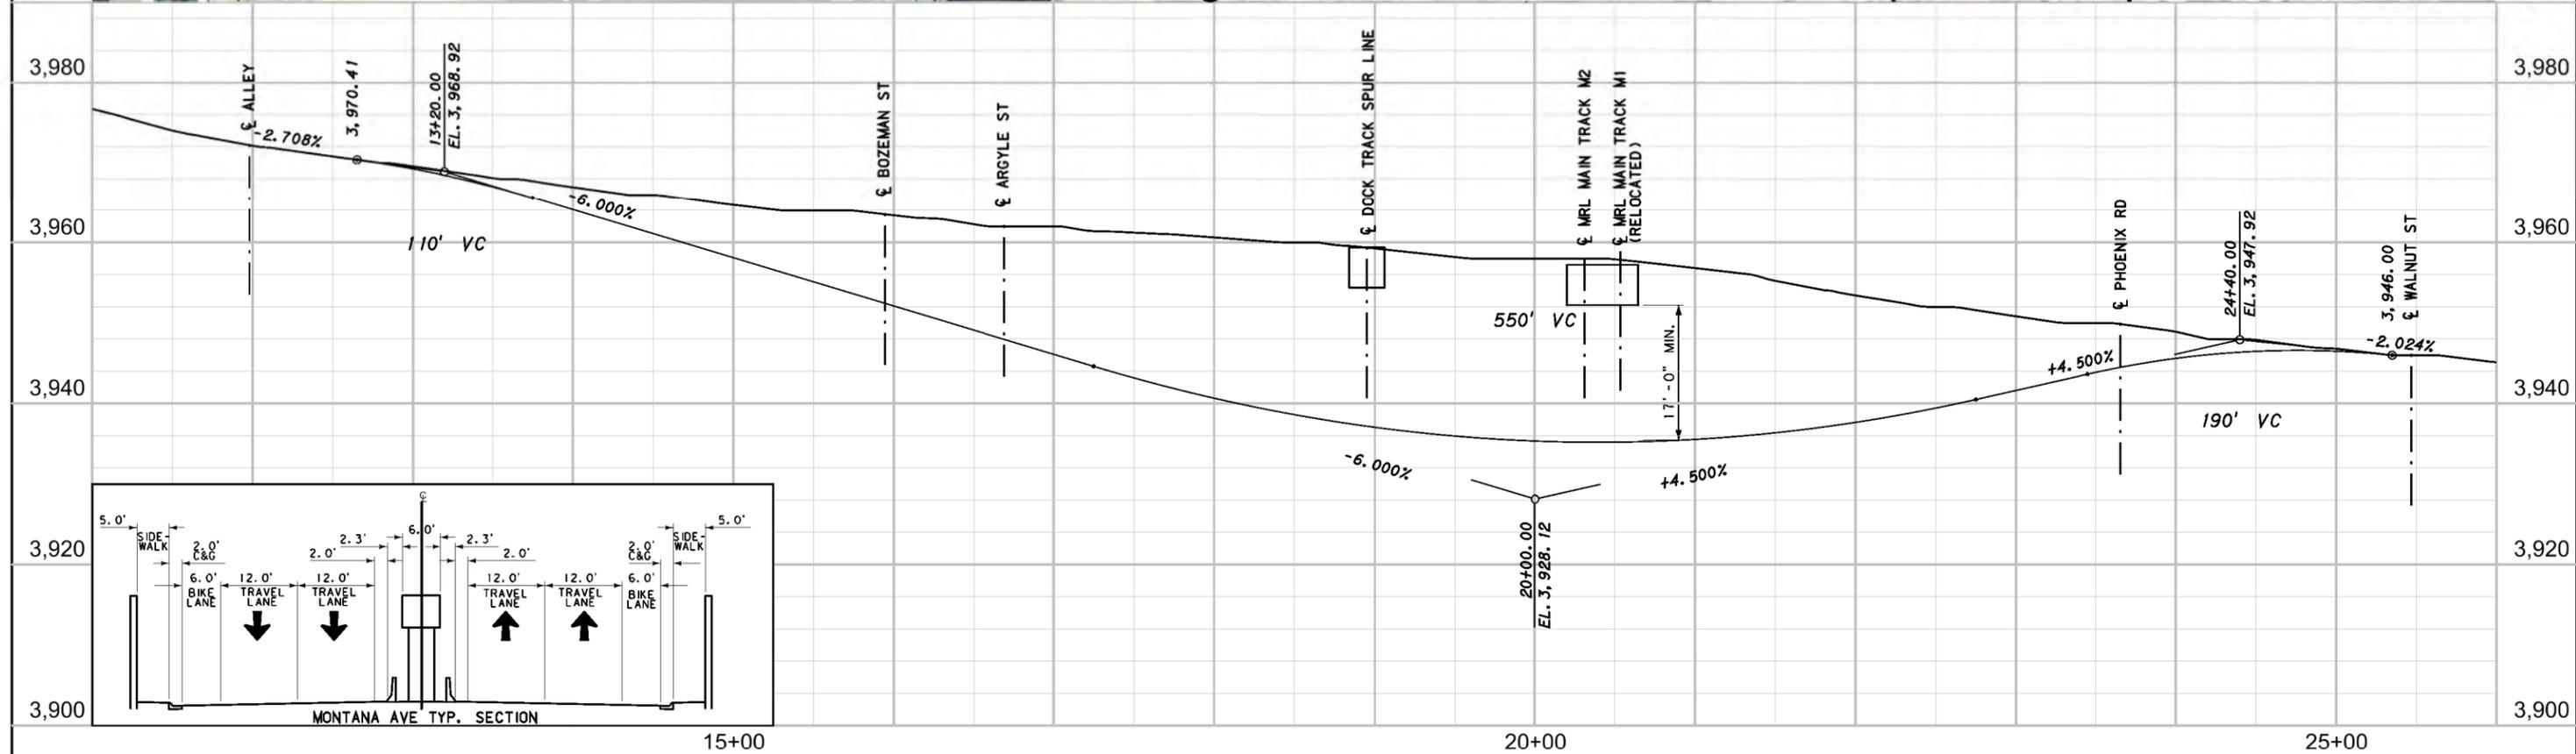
Montana Avenue Underpass Conceptual Plan and Profile
